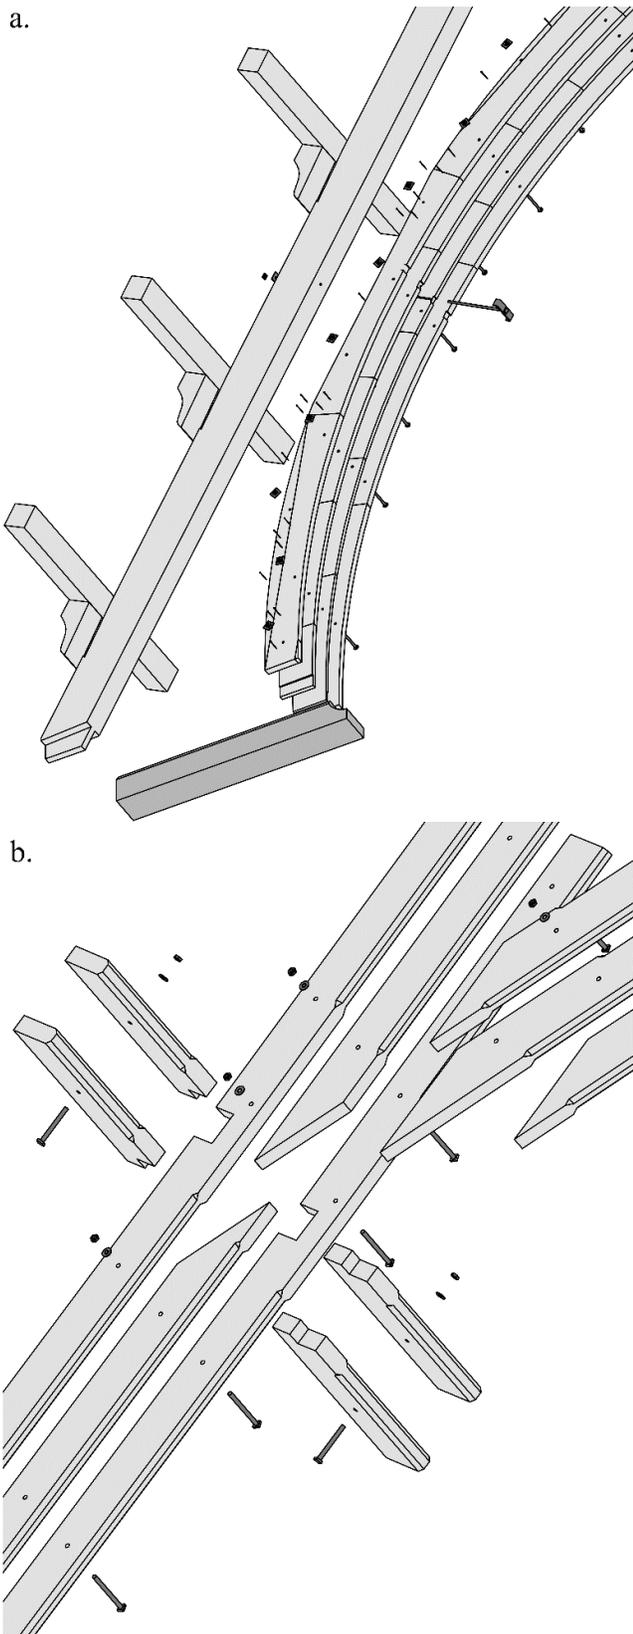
a. Half-arches made from straight planks, assembled with nails and bolts (*Porte de Hal/Hallepoort*, Brussels, 1871). 3.b. Straightforward assembly of standardized joists. Span: 14.6 m (*Institut Saint-Jean-Baptiste de la Salle*, Saint-Gilles, 1911).
